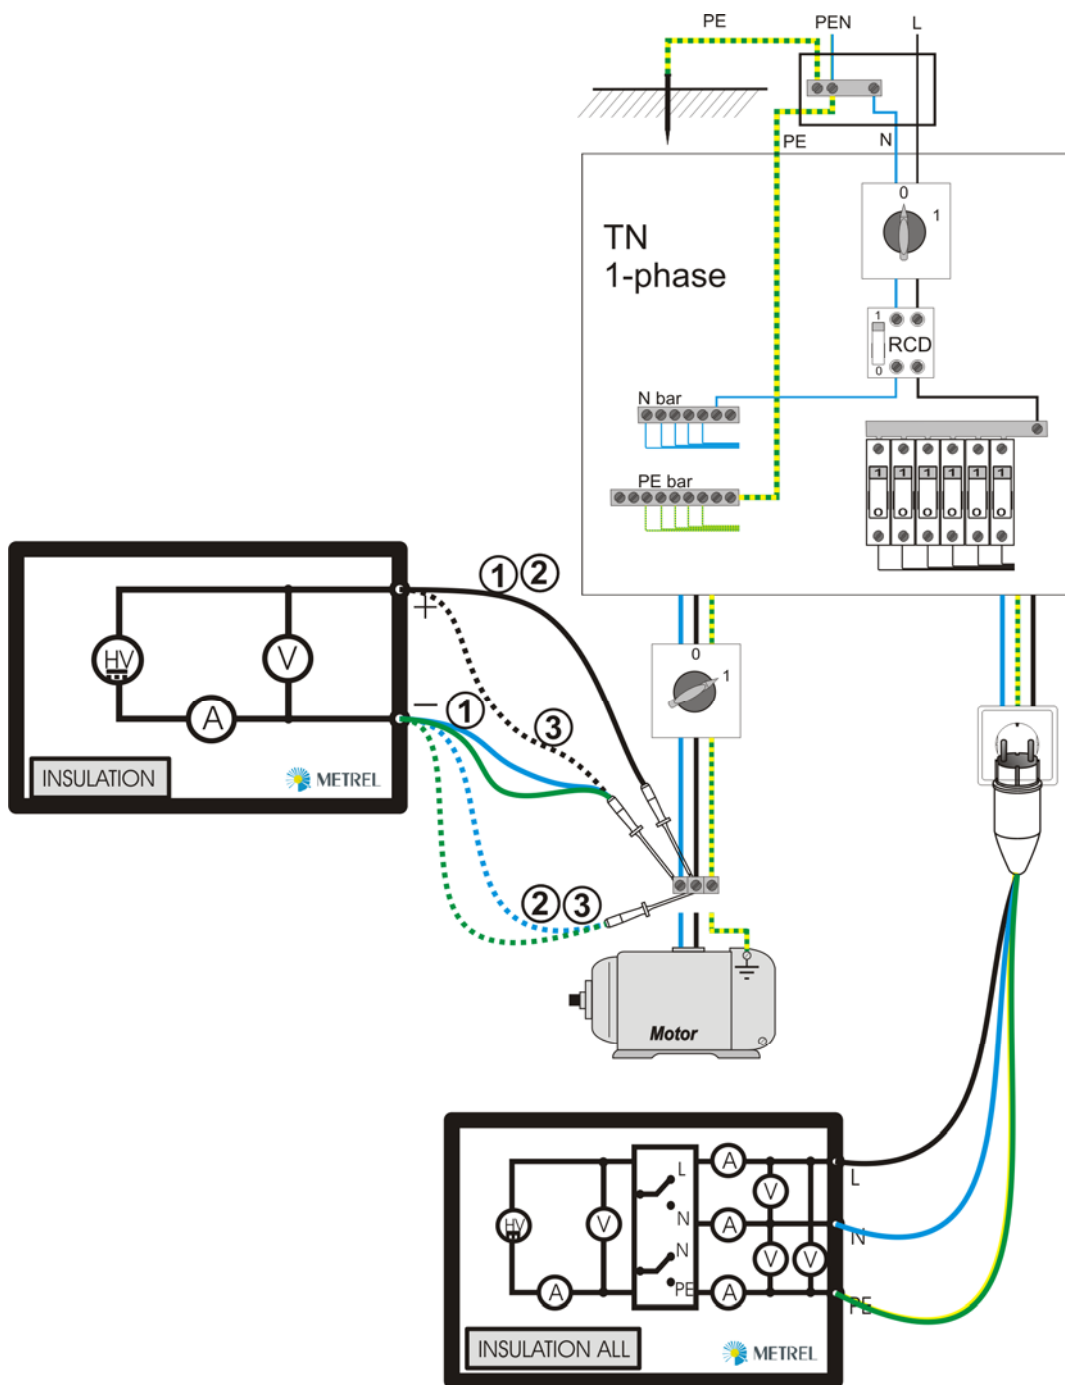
Complete insulation test at connection point; on outlet (Insulation ALL feature)
